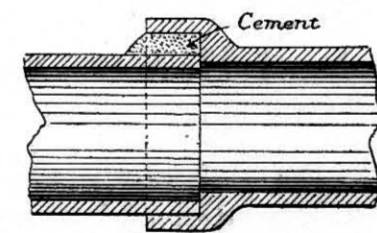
Faulty Drain-pipe Joint:—Bad Alignment.
